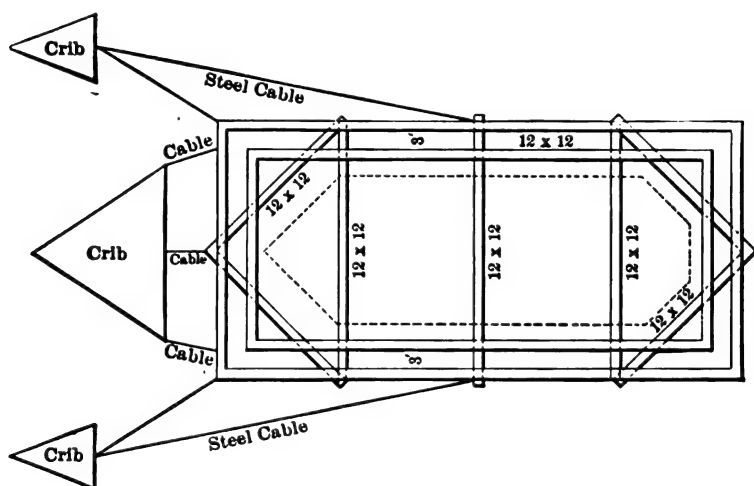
CRIBS FOR ANCHORING ST. LOUIS COFFER-DAM.
